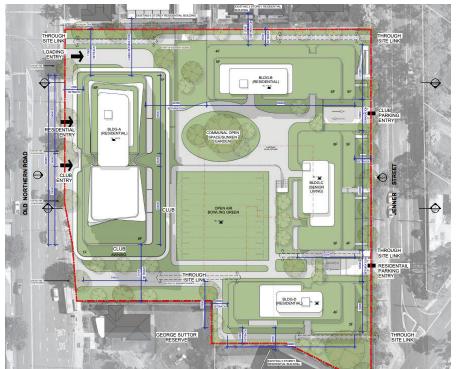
Site Plan showing building setbacks compliant with the controls prescribed above (Source: Altis)
